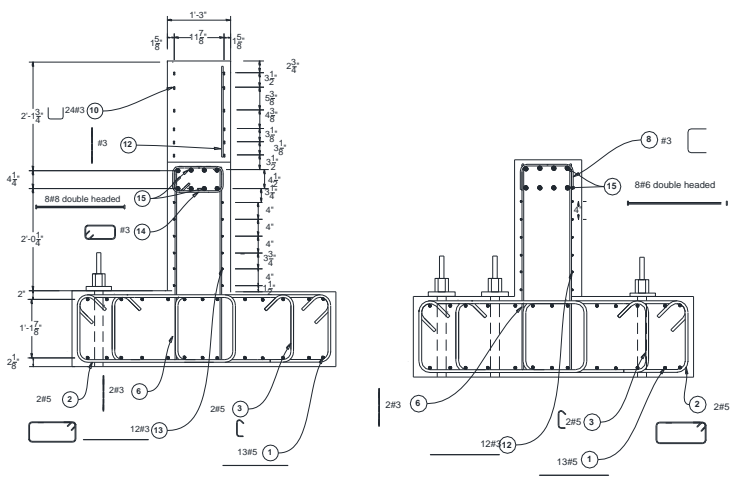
Section E-E (left) and Section F-F (right) in design drawings for Specimen 12 (see Figure 8.2 for the location of the sections)
